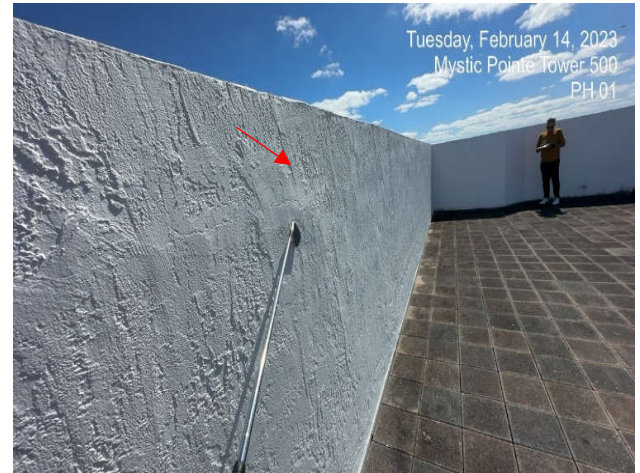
c.23 – Stucco delamination and hollow sound at parapet wall (Unit 1513)
